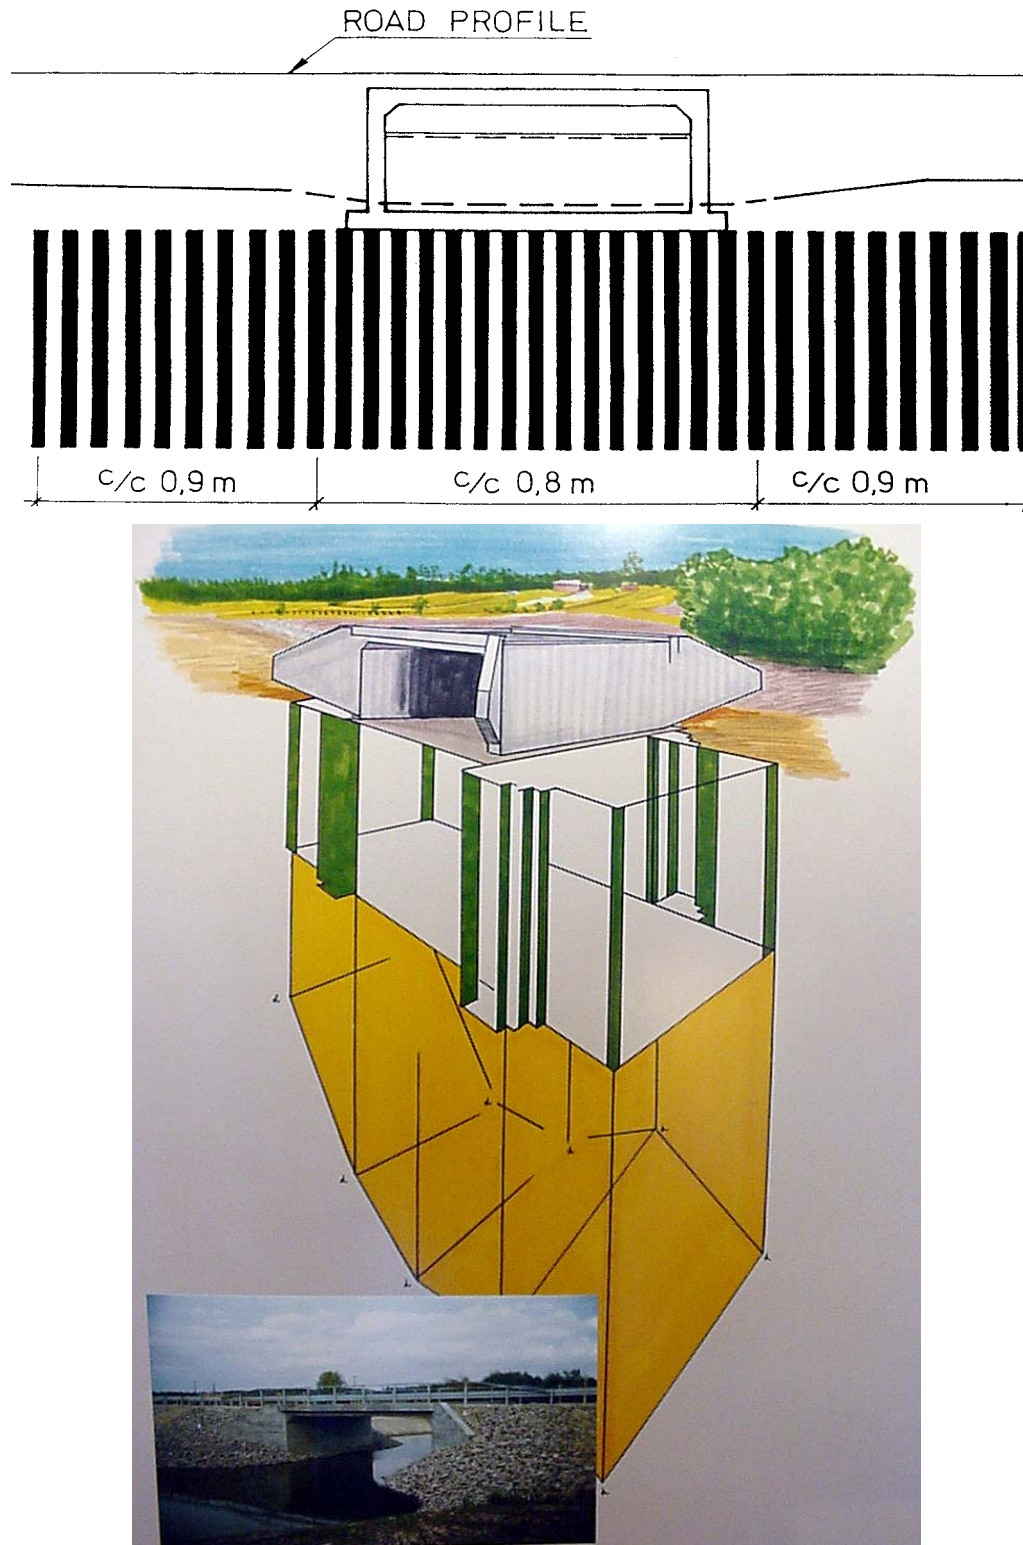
Deep soil stabilization for a bridge and the approach embankments in Sweden.
